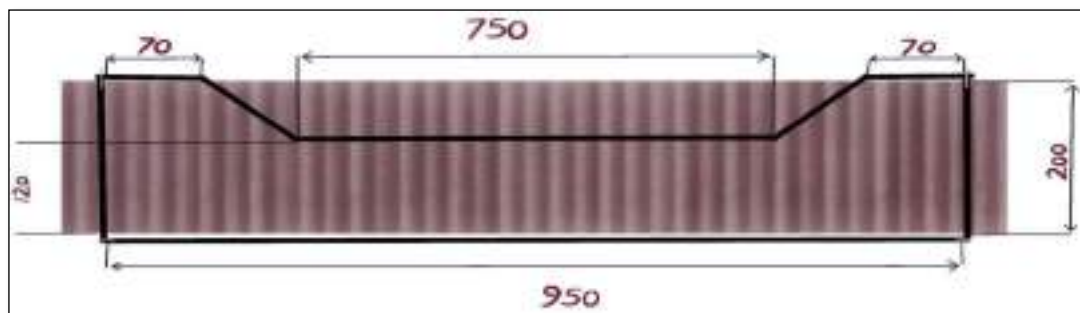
Integrated Formwork Plan (all units in millimeters).
